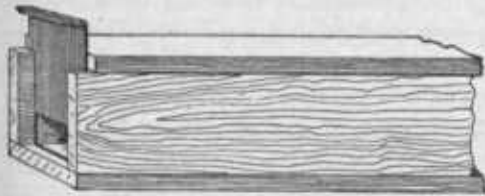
Pipe for ditch bank made from half-inch boards.
